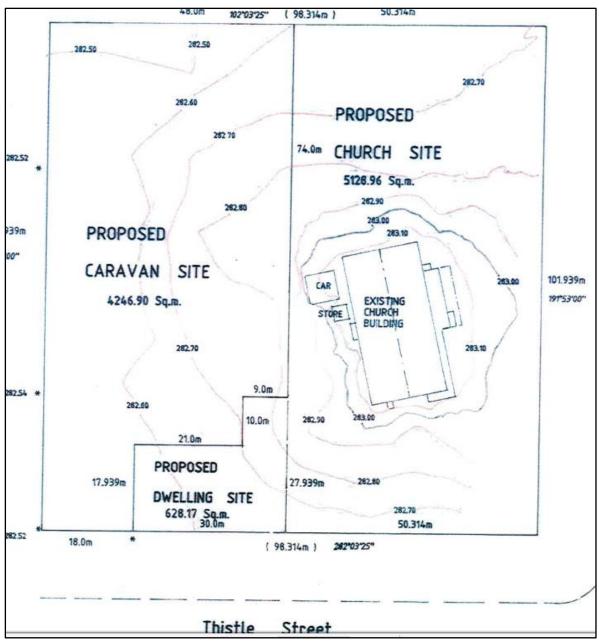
Reconfiguration Layout (Source: Extract from approved plans)
